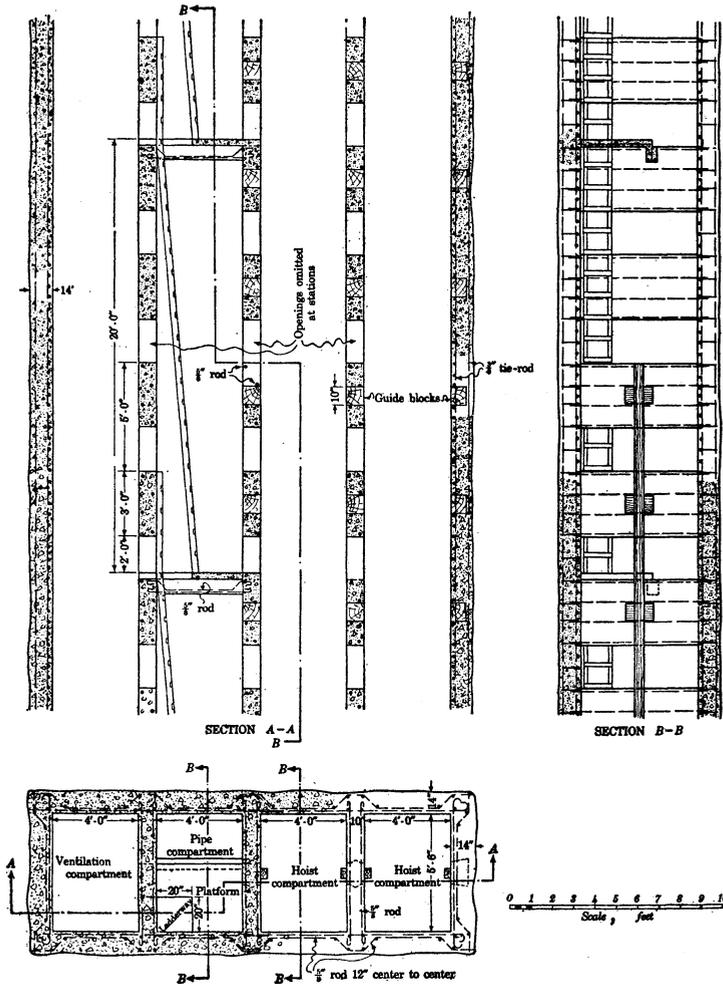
General shaft plans and standard reinforcement, Magma Copper Co.
